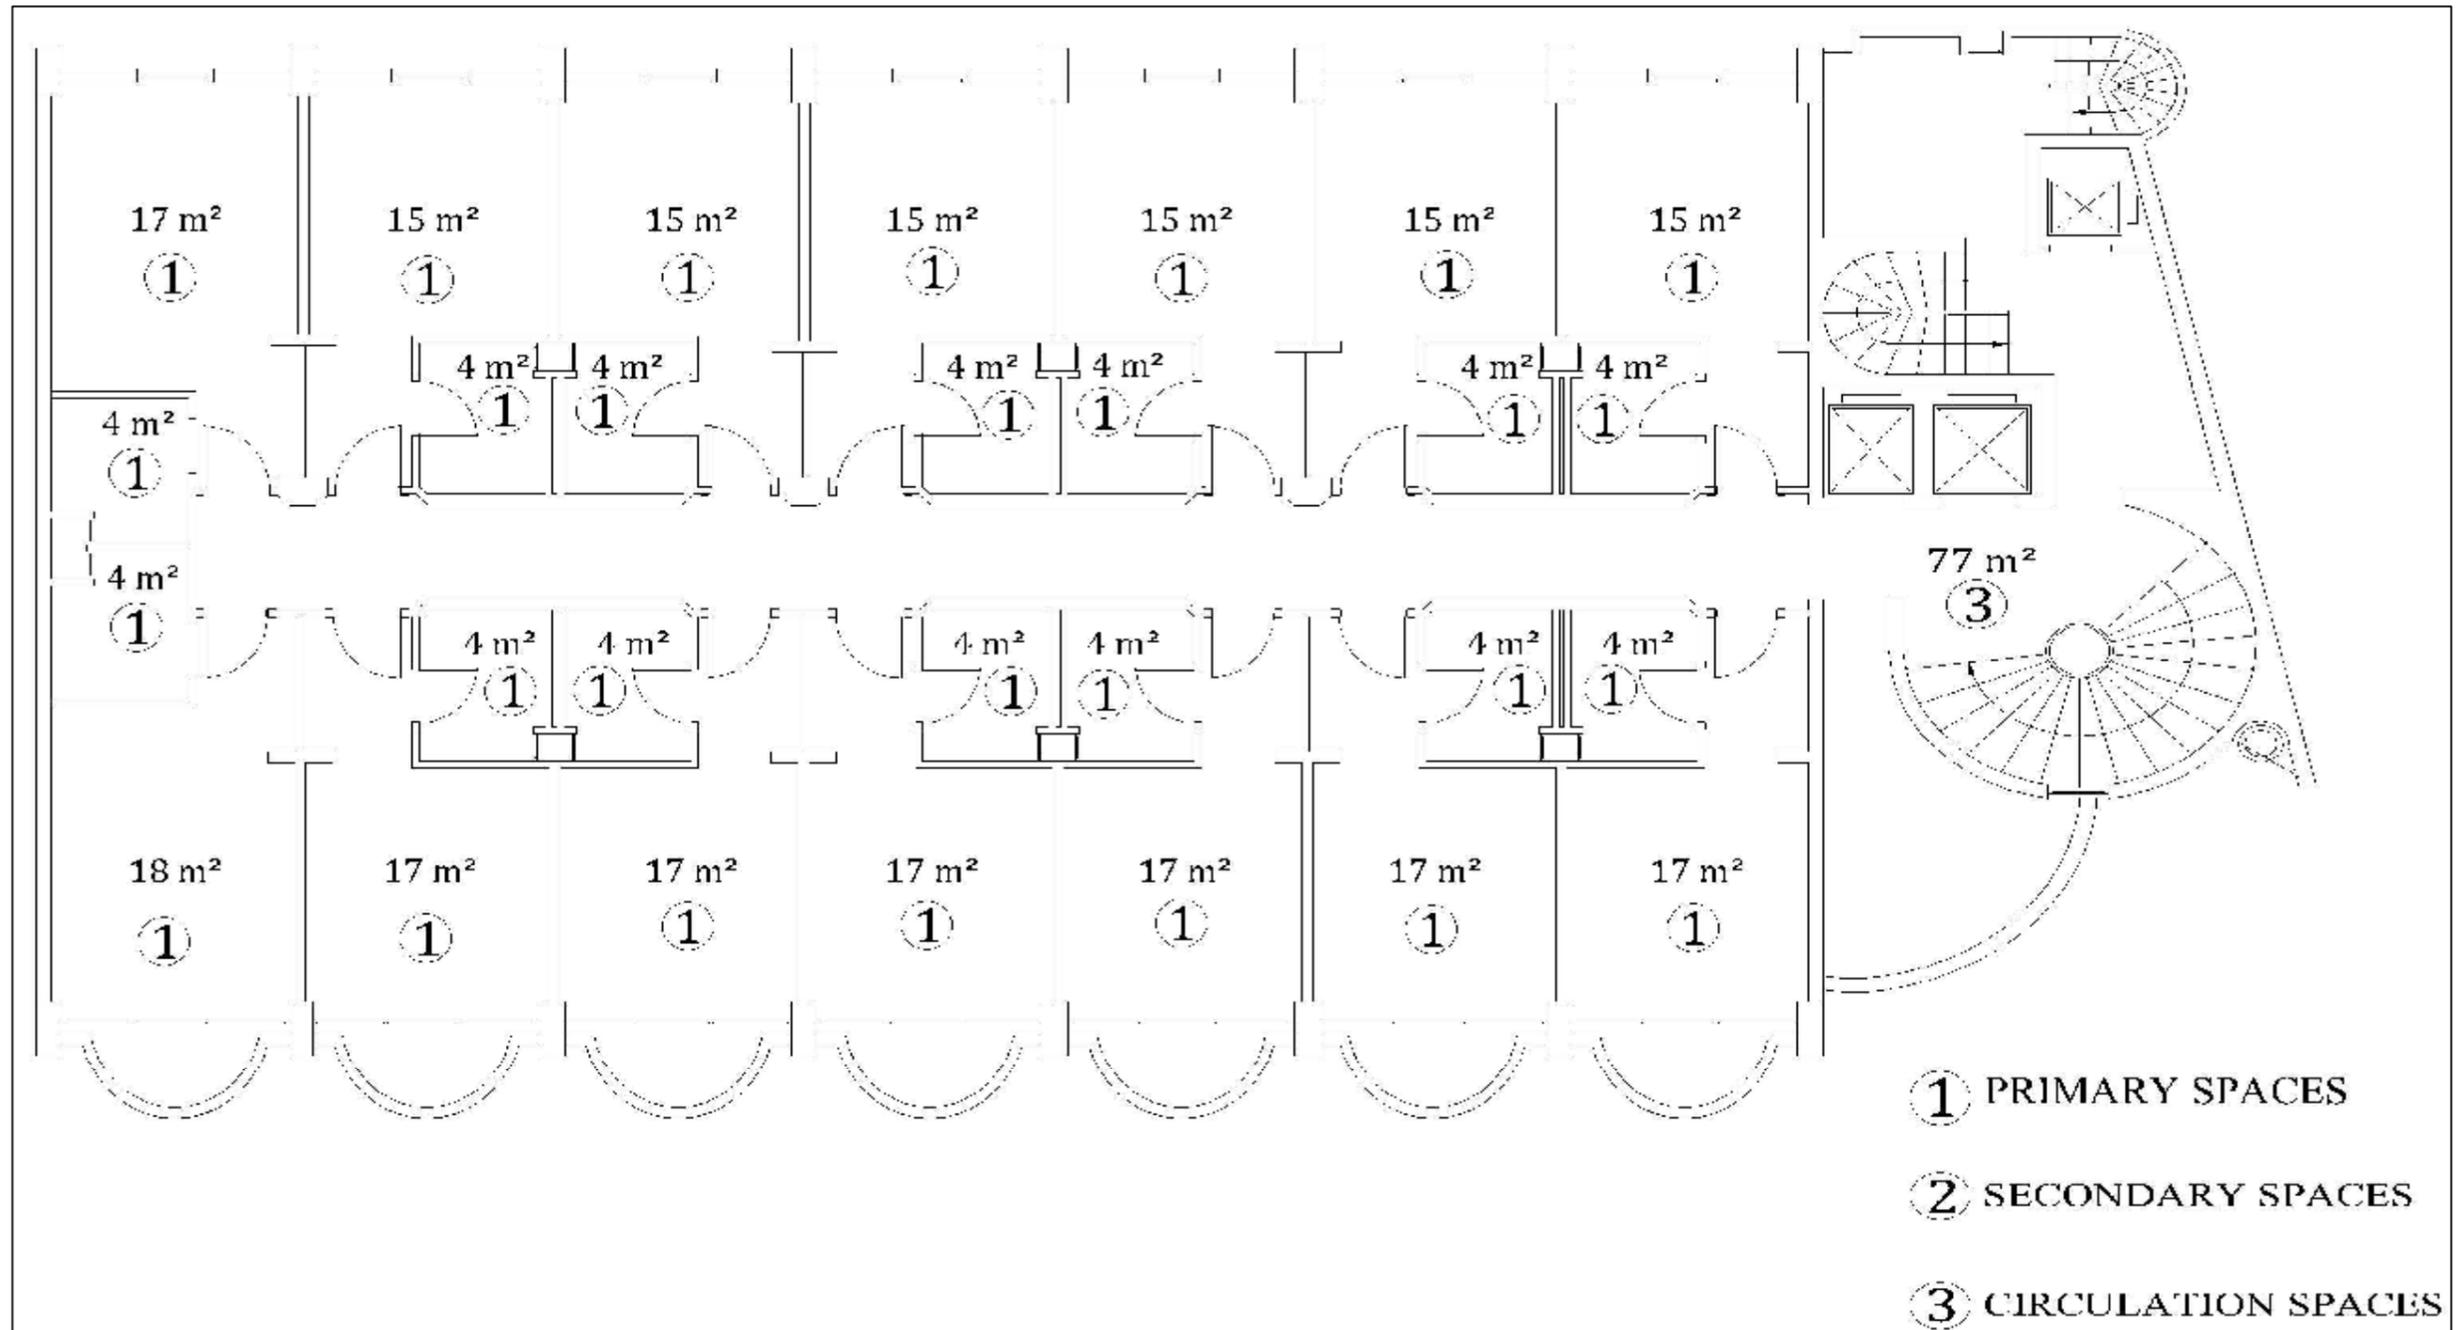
Floor plan of Sample 05 (S05) displaying, primary, secondary and circulation spaces.
